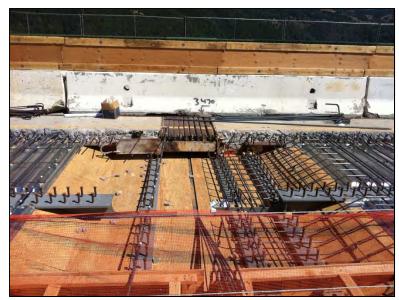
Bridge Expansion Bearing Replacement During Deck Widening
